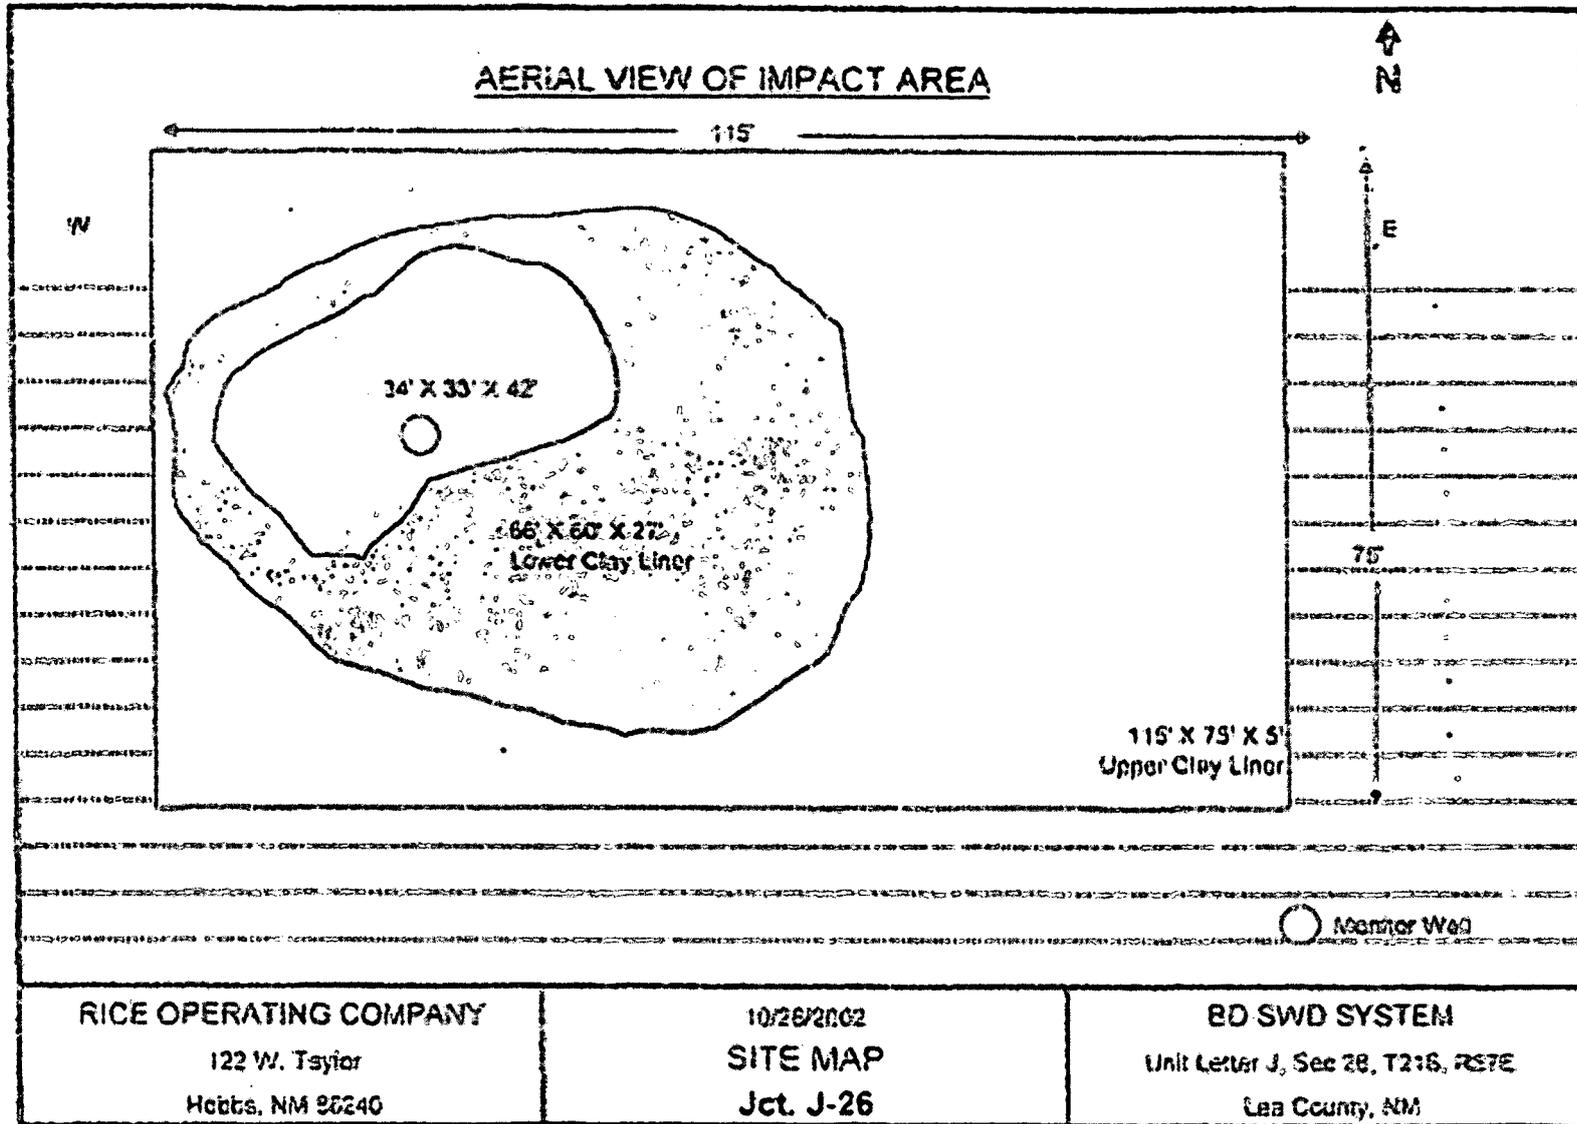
Plan view of cross sectional diagram of excavated soil at BD J-26 in 2002.
